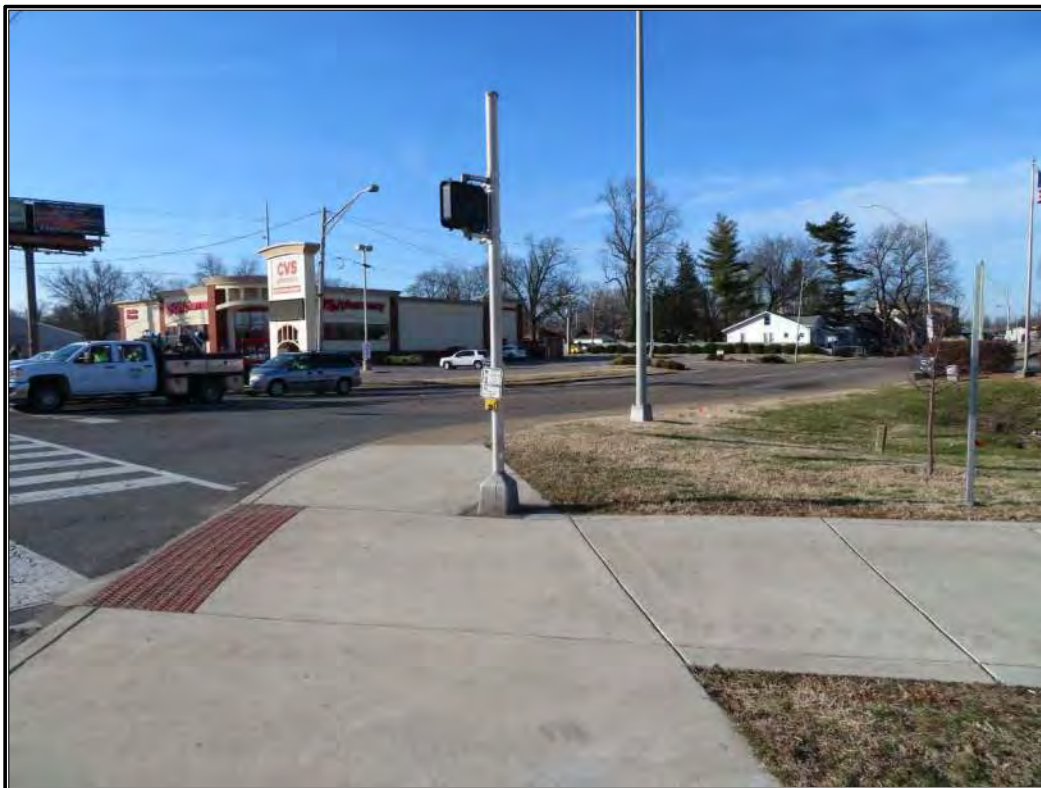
Overview of project area at the intersection of Washington Avenue and US 41, looking southwest.
